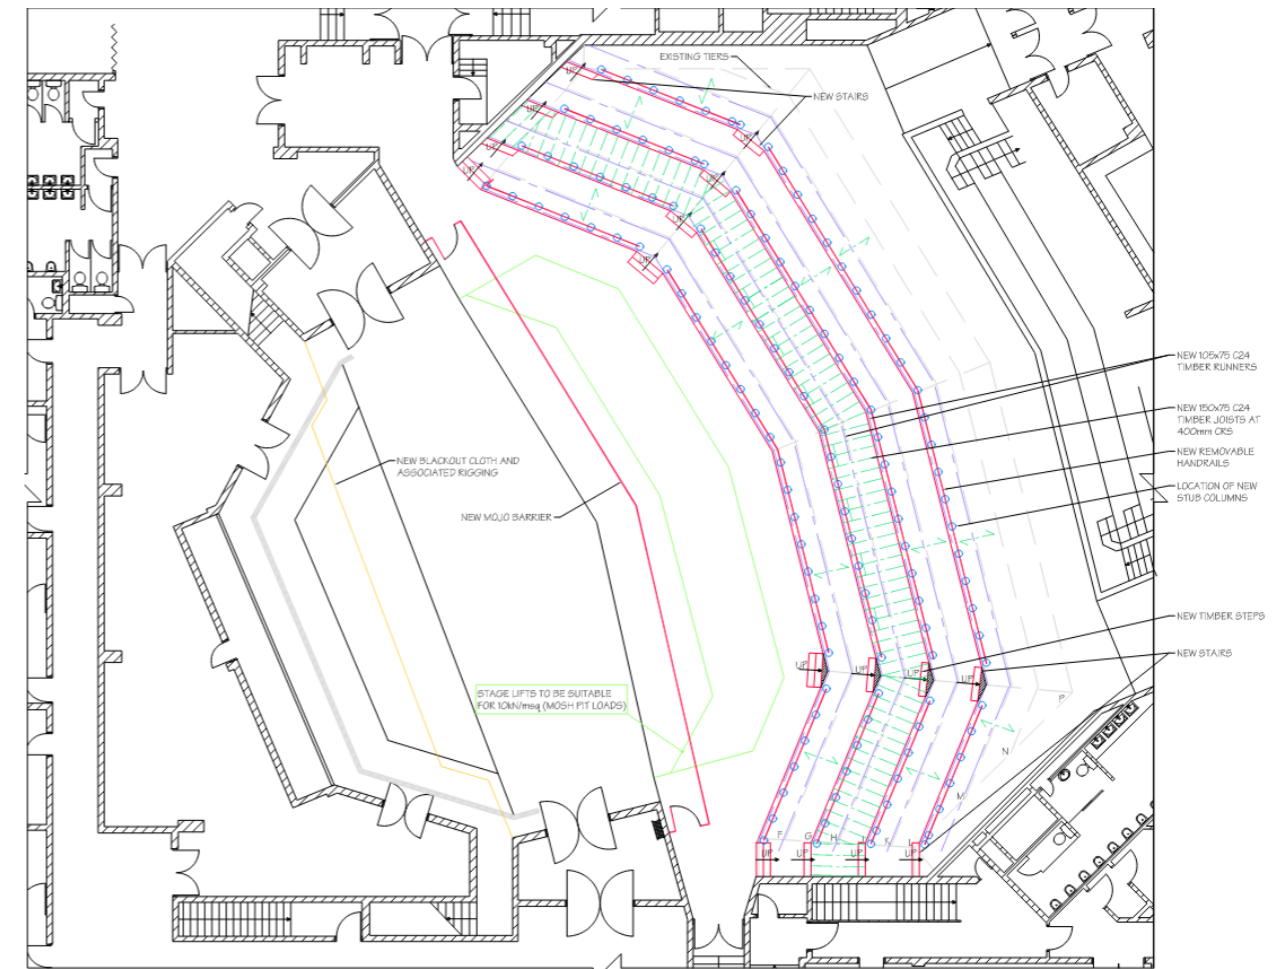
Plan view of the LiveNation academy proposals showing new altered stalls seating area
